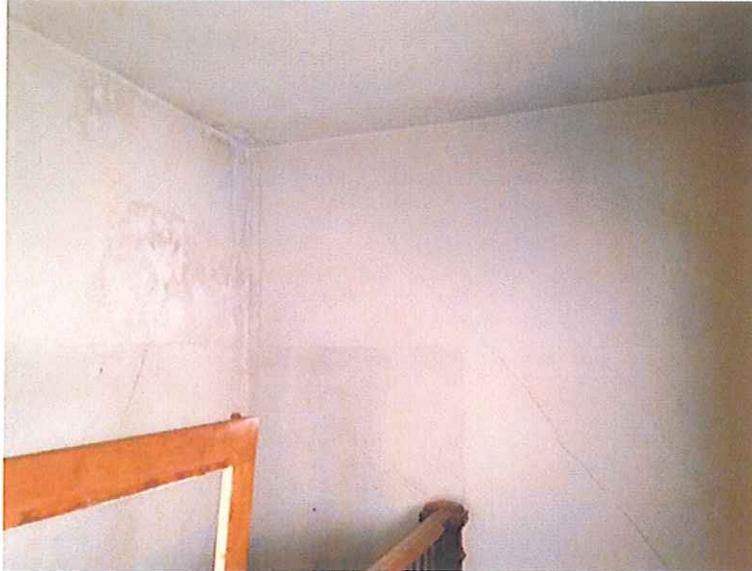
South Wall Interior Showing Deteriorated Brick Masonry Veneer
